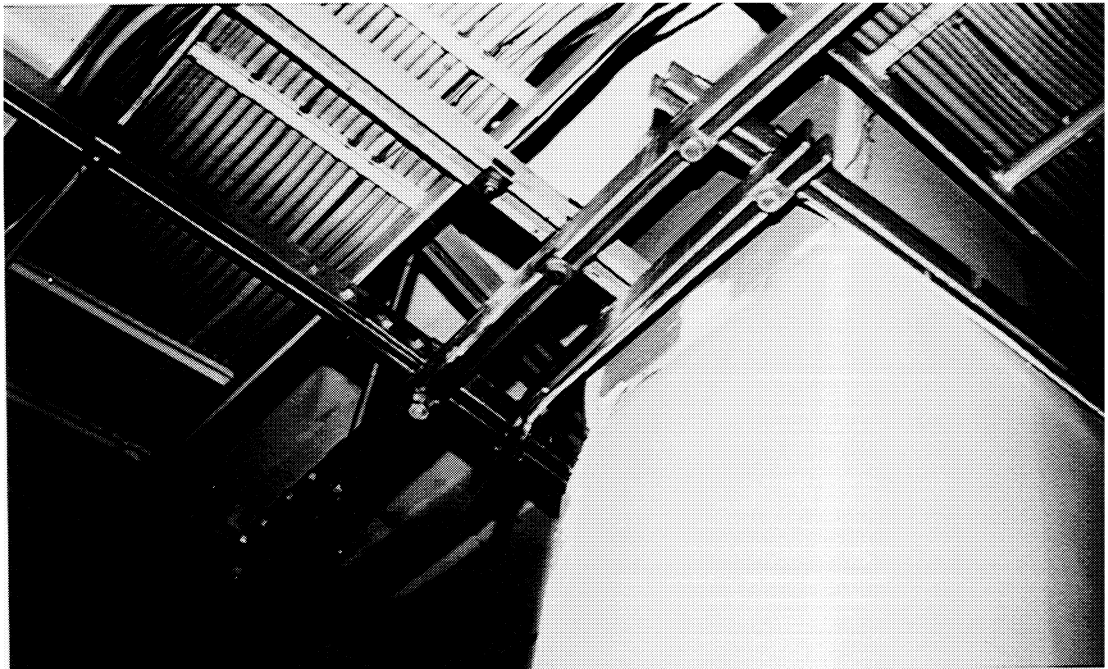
Movement of the framing system exceeded the clearance between the frame and the building structural column, causing damage to the framing system.
